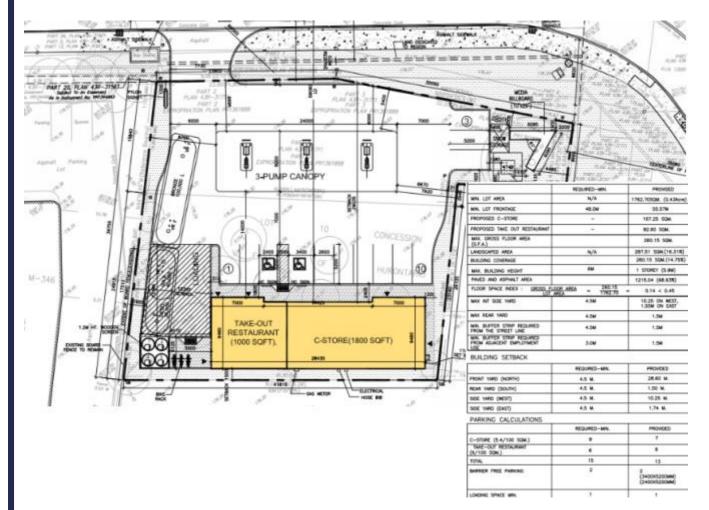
SITE PLAN AND SITE STATISTICS
